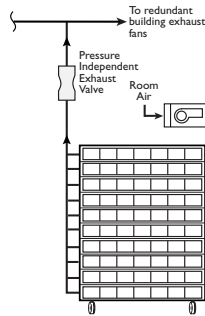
Option #3: Room air with rack supply fan; rack exhaust connected directly to building.
